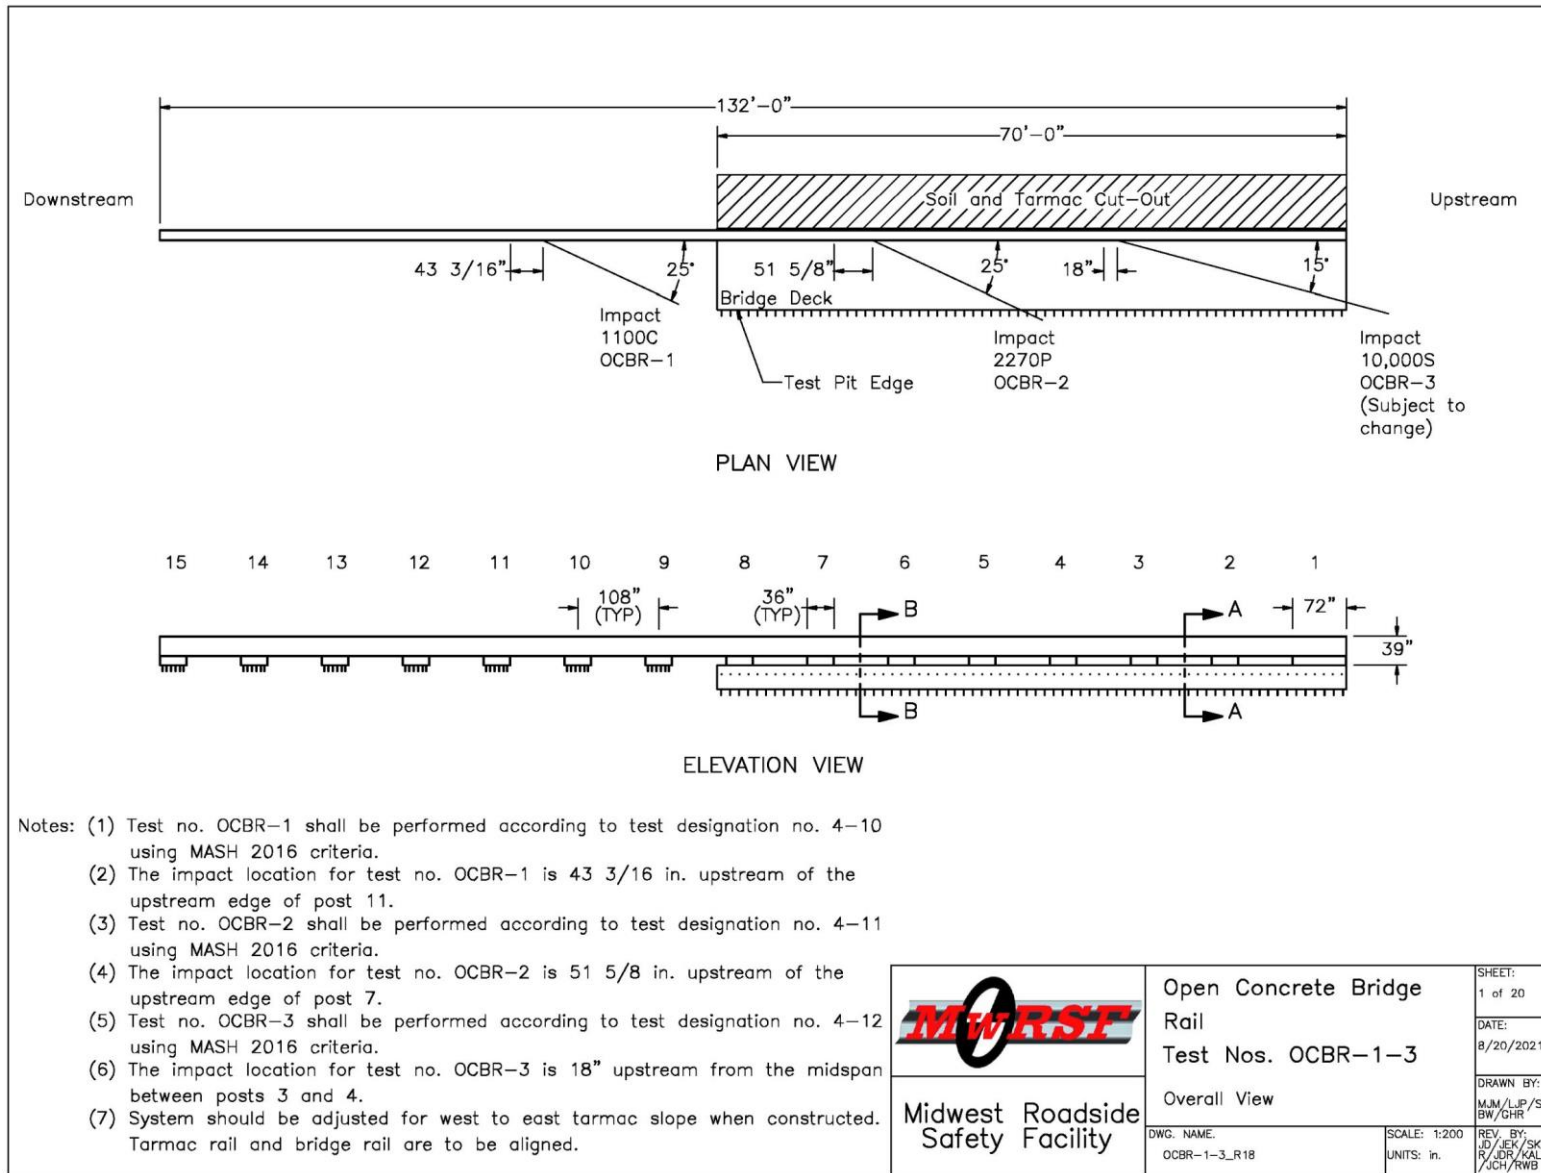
Test Installation Layout, Test Nos. OCBR-1, OCBR-2, and OCBR-3
